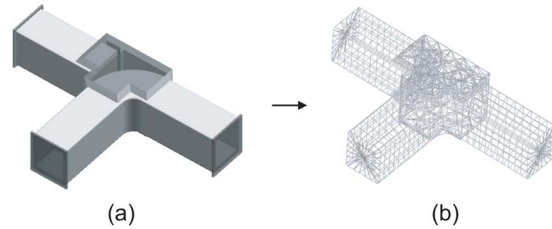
(a) Detailed 3D solid model of a joint and (b) its FE model with plate elements for beams, solid elements for casting, and plate elements for welding
